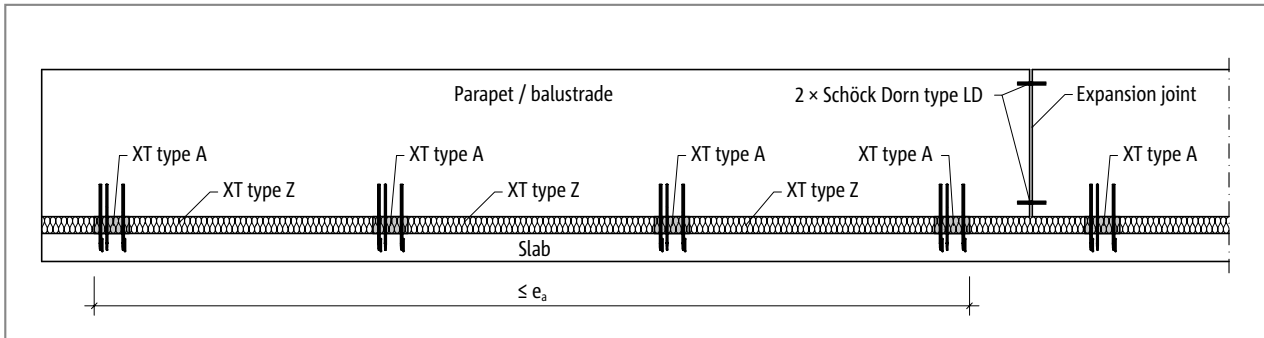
Schöck Isokorb® XT type A: Expansion joint arrangement
